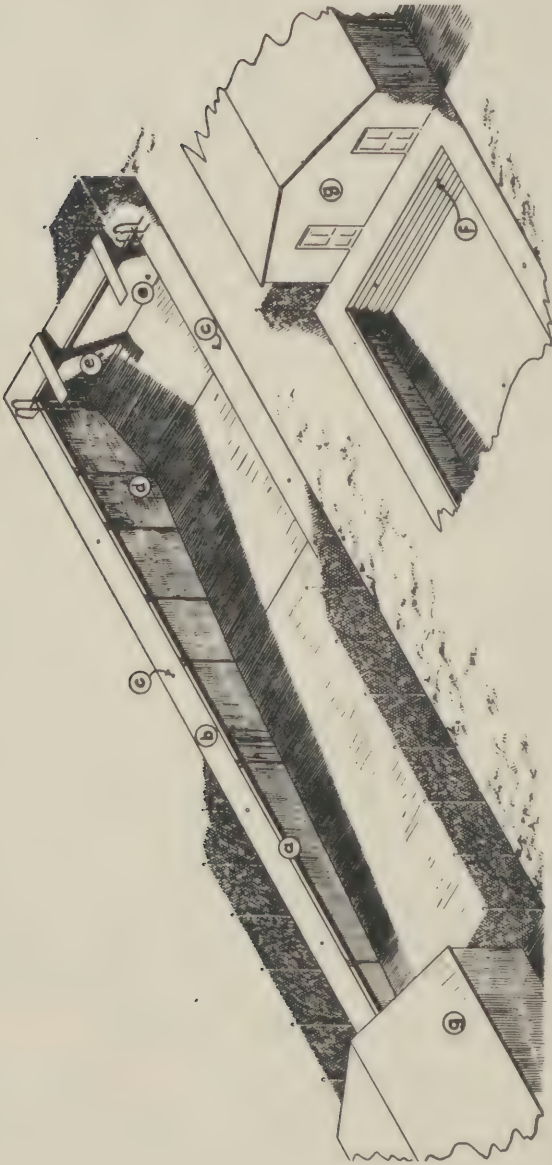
Fill and draw swimming pool. a—Scum gutter. b—Runway. c—Runway drains. d—Pool outlet. e—Inlets at deep end of pool. f—Inlets at shallow end of pool. g—Bathhouse.
